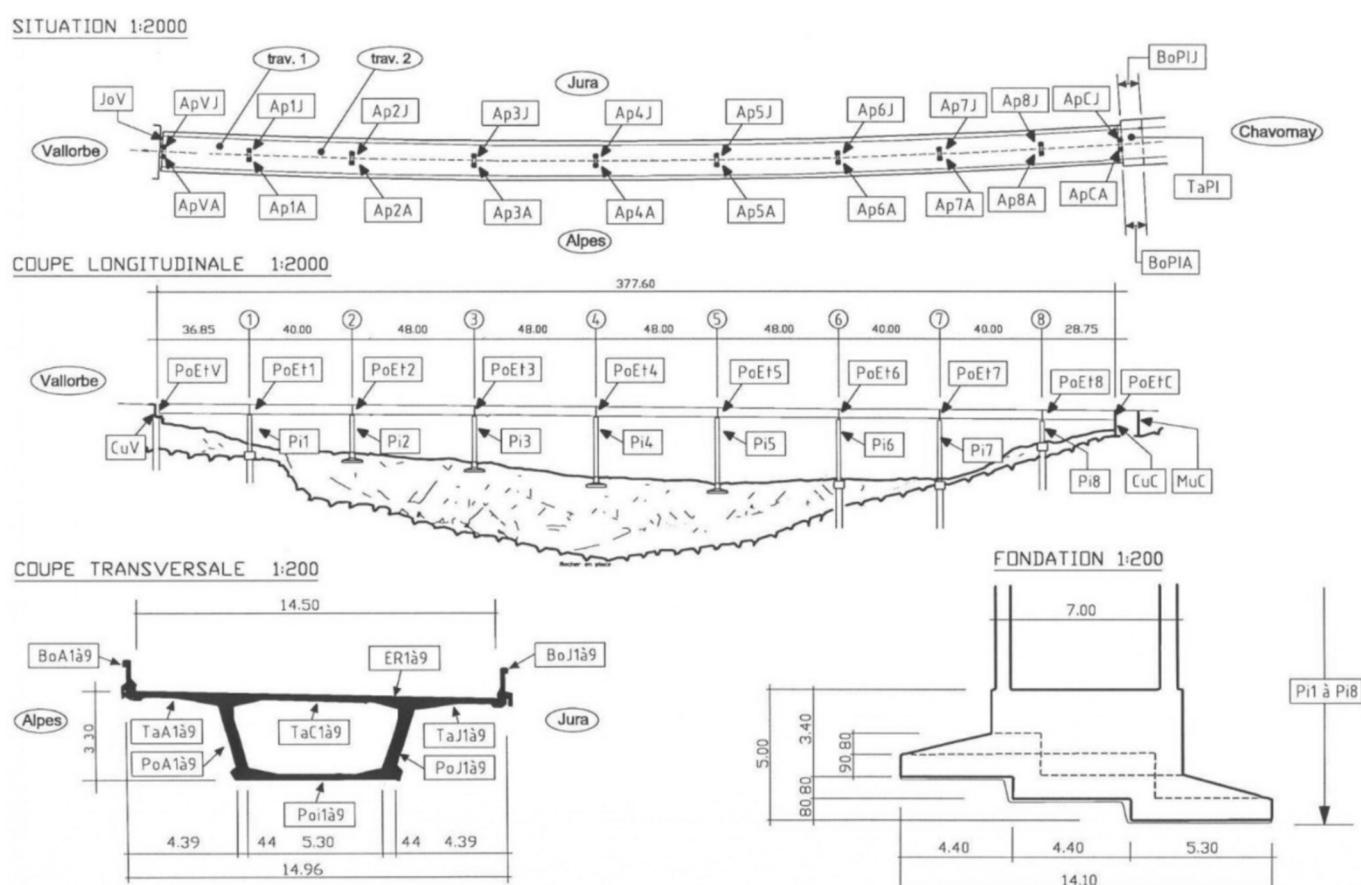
Comprehensive illustration of bridge Praz: plan, elevation, cross-section, and foundation details.
